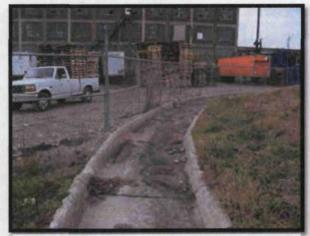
Vegetation/concrete drainage swale, southwestern side of Taracorp pile cap (view southeast).
